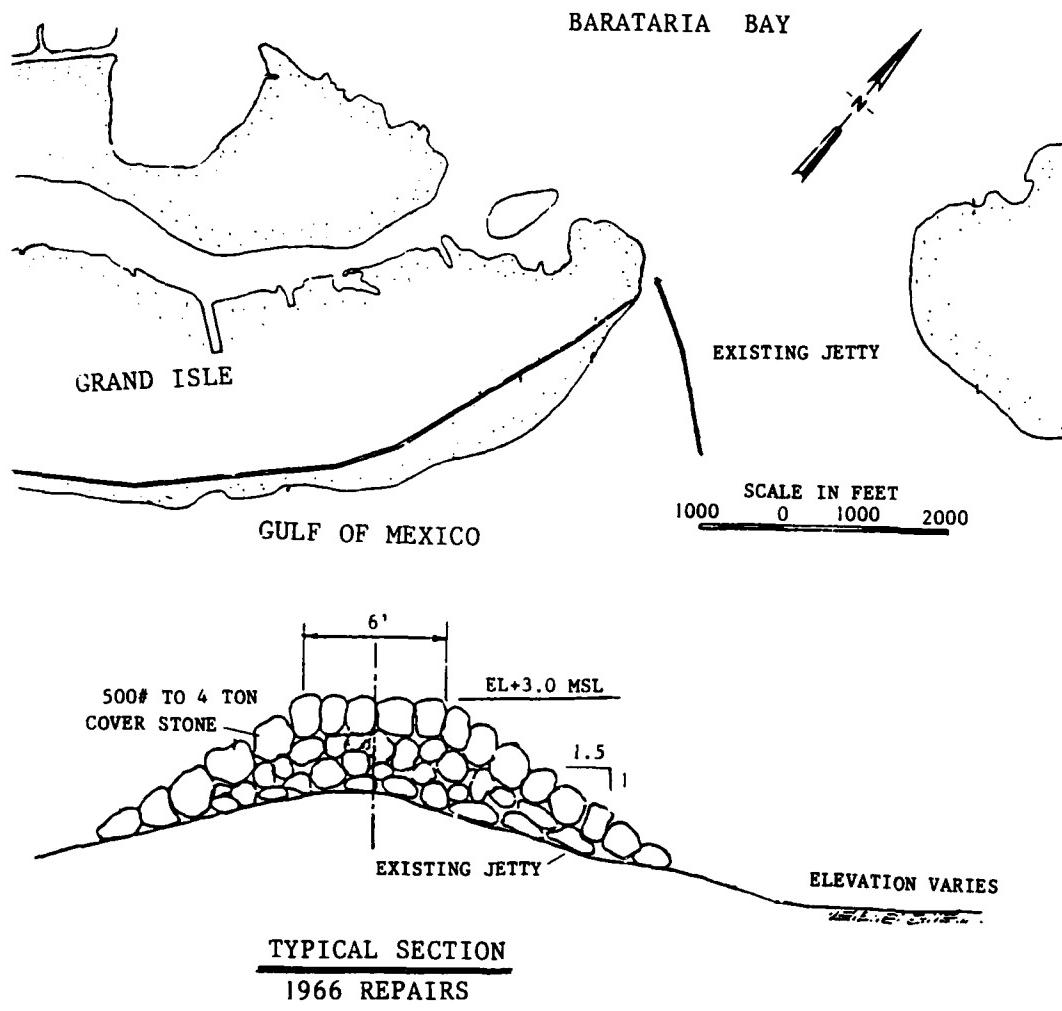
Plan view of Grand Isle jetty and typical 1966 repair section
